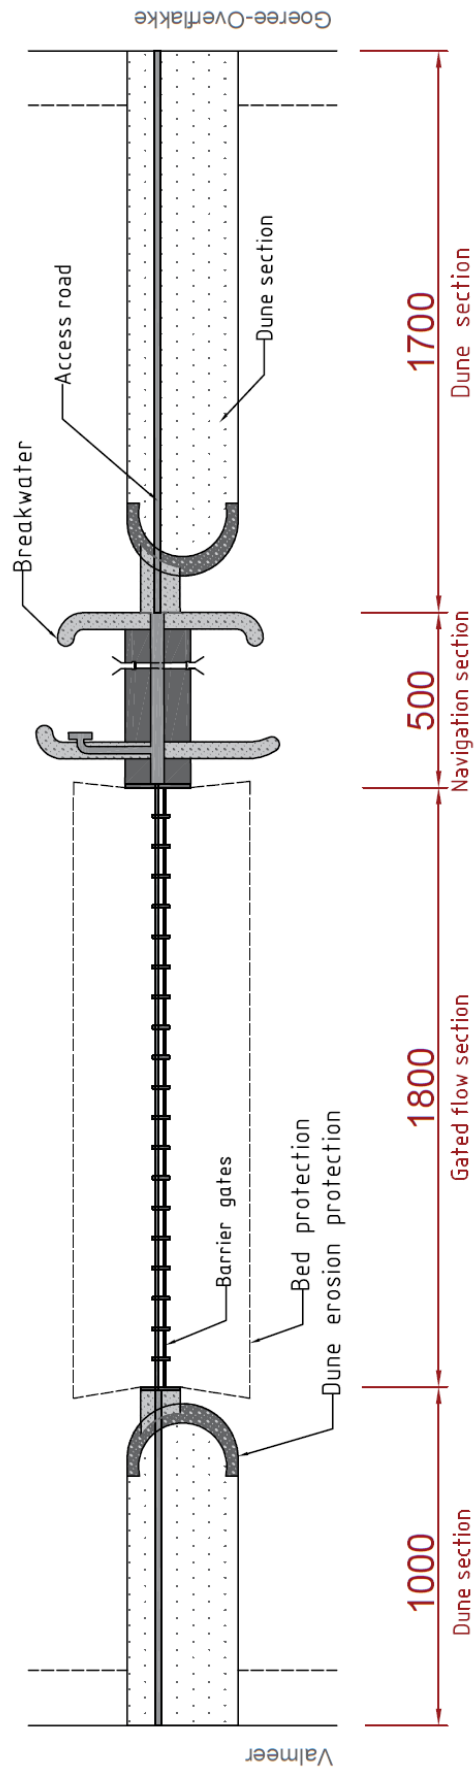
Spatial design for the New Haringvliet barrier. The dune sections are connected to the structural barrier elements by short breakwater sections. The navigation section is a shipping lock sheltered by breakwaters.
